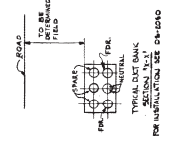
HAZARD SUBSTATION IMPROVEMENT PLAN DRAWING
